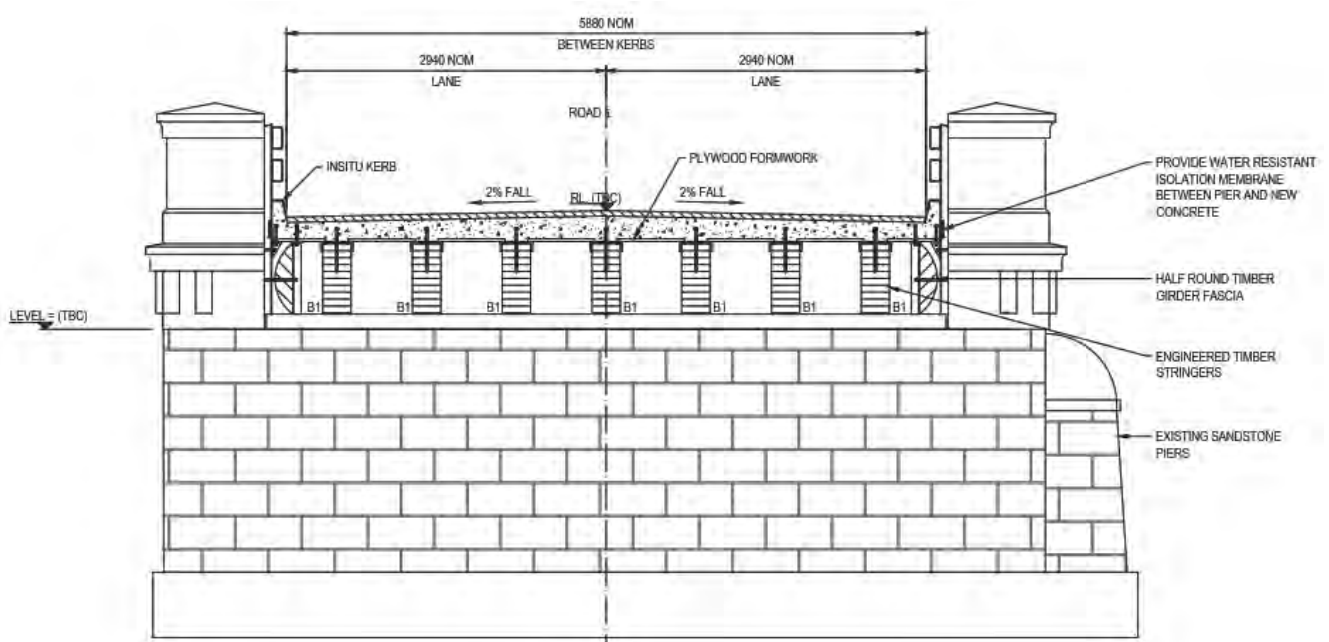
CROSS SECTION OF PROPOSED WORKS
